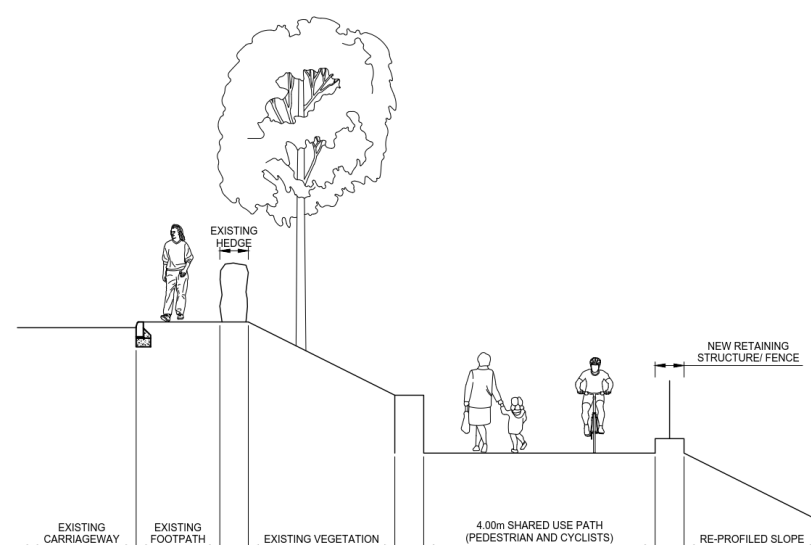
Cross Section Route 5 – Route through Haugh Park
